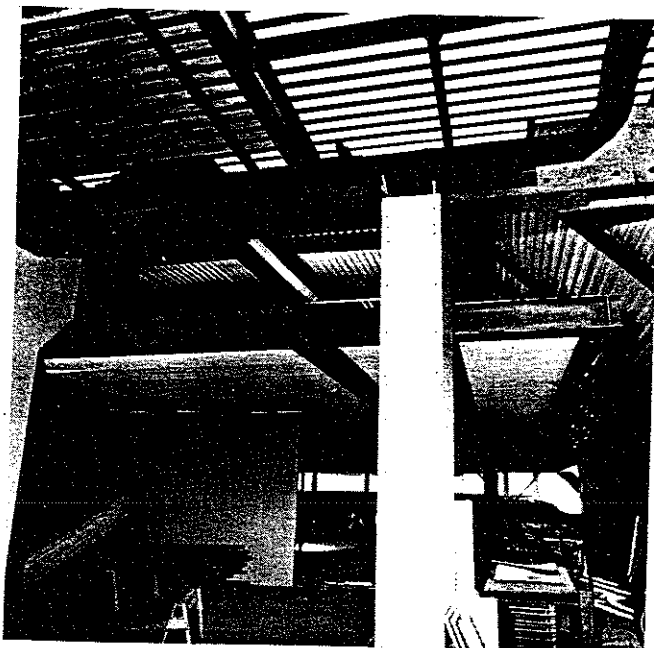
a. Steel columns with fire insulation in the form of gypsum plaster slabs. The girders are insulated with slabs of mineral wool
